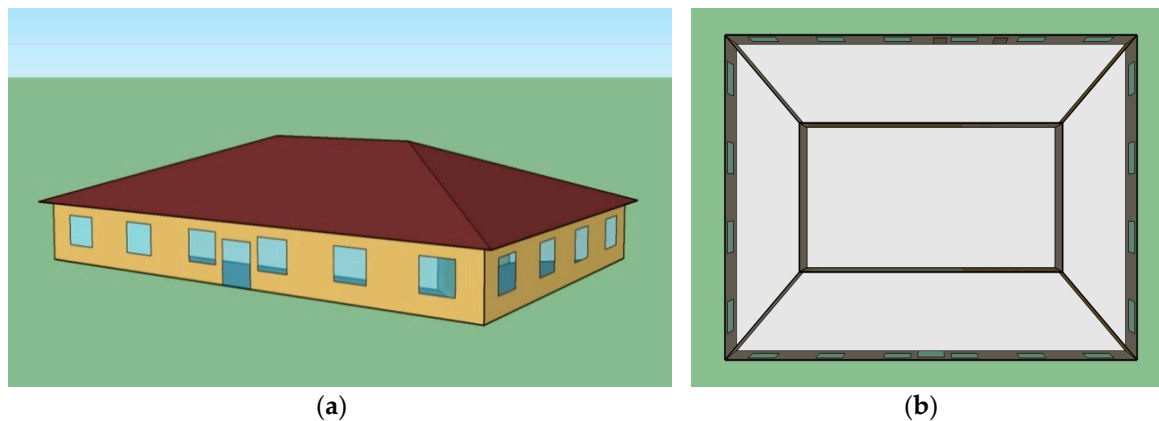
Case study ASHRAE standard model for small office building: (a) 3D view; (b) floor plan perspective view.
